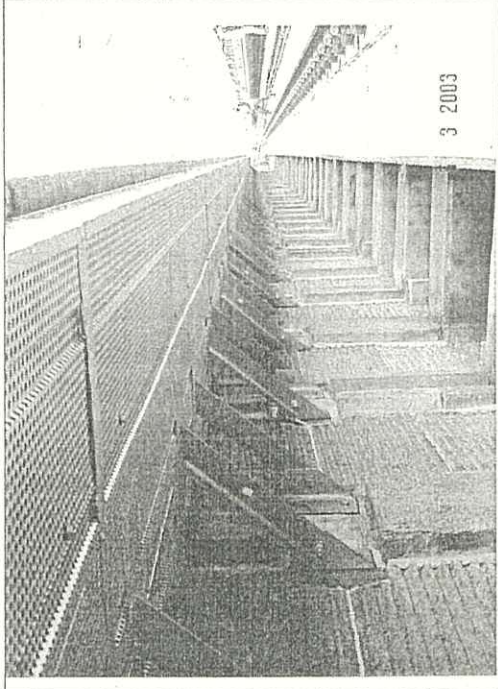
SAM on Parapet (Lower Section) & Below Walkway
